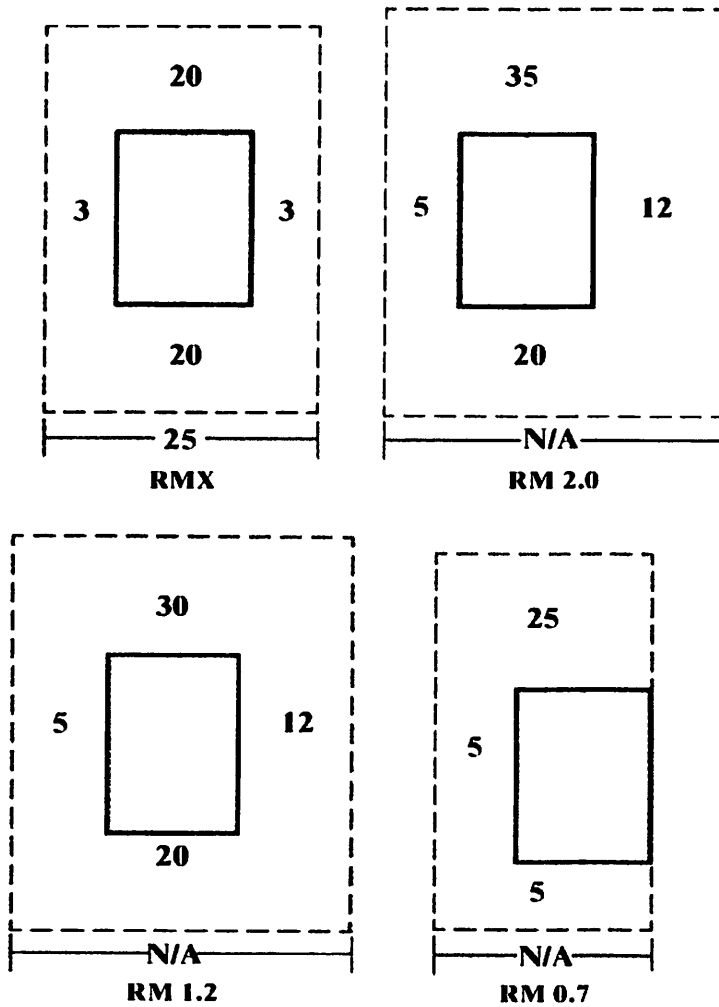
Minimum Setbacks for Multi-Family Buildings 35 ft. in Height
